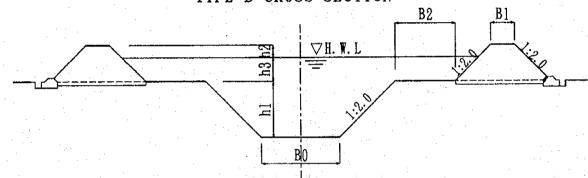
PROPOSED CROSS SECTIONS FOR (1/3) UPPER INDRAGIRI RIVERS
